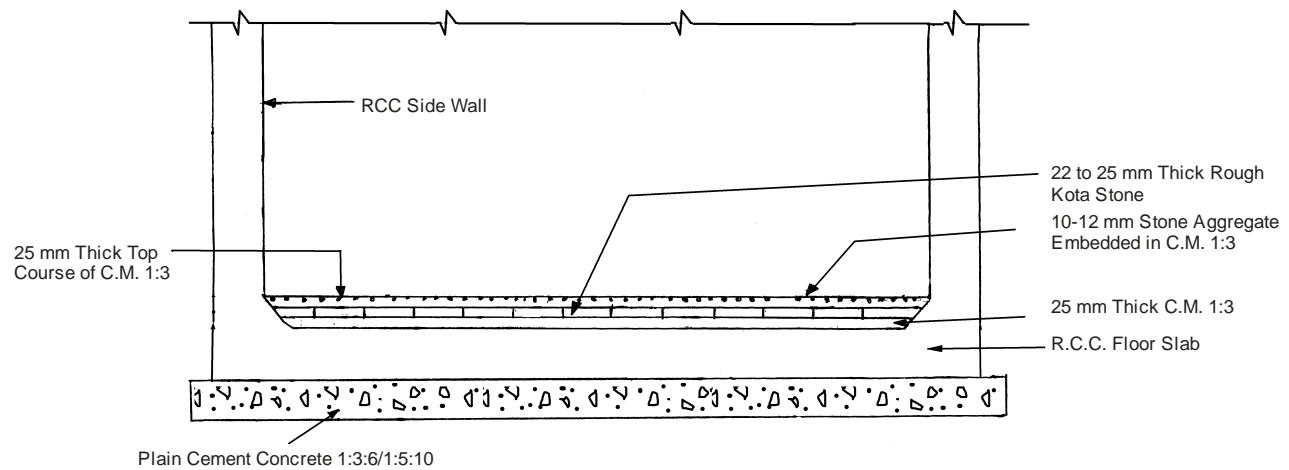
Water Proofing Horizontal Surfaces from Inside of a U.G. Structure
